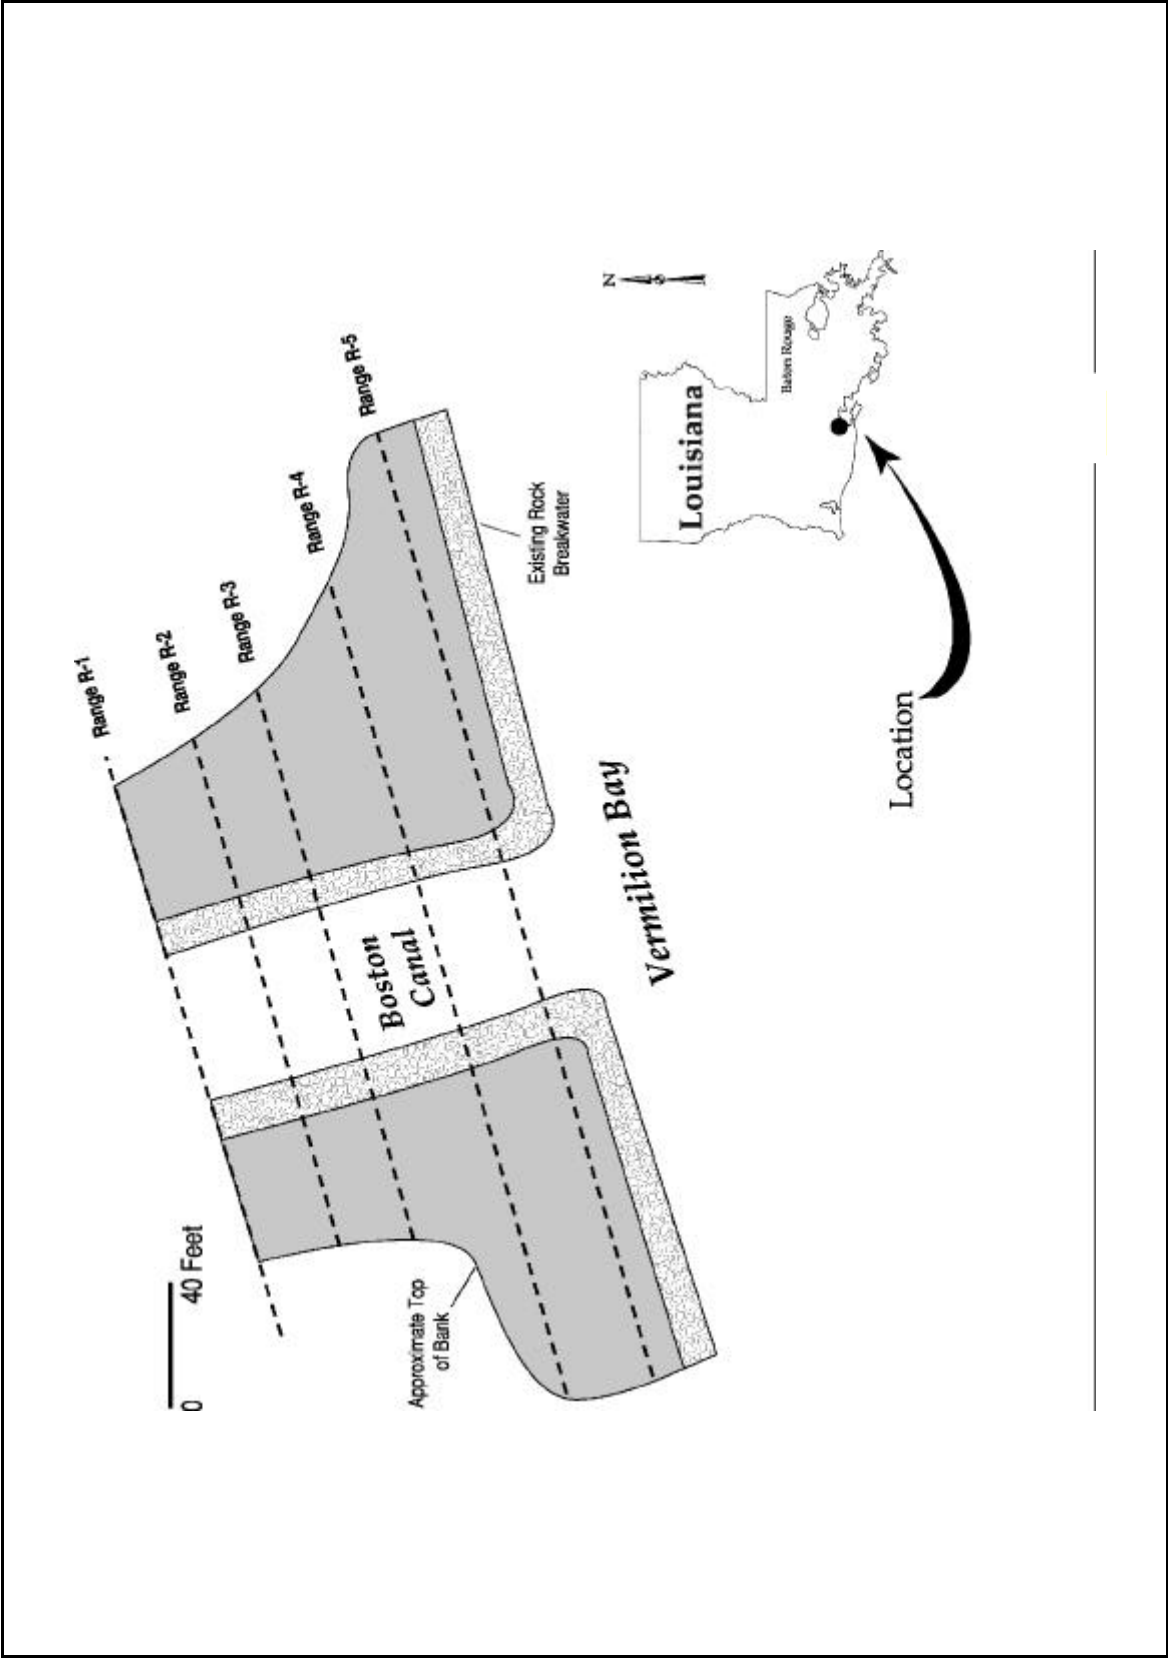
Boston Canal/Vermilion Bay Shoreline Protection (T/V-09) cross section of the mouth of Boston Canal labeling elevational transects.
